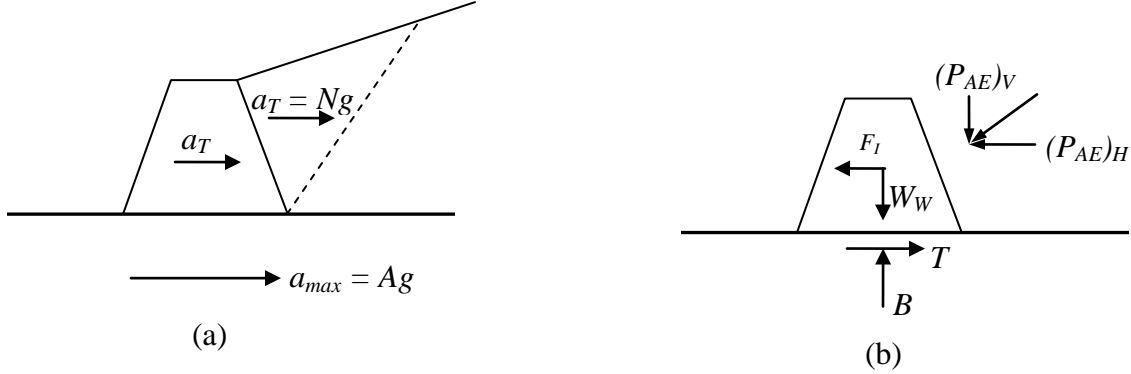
Idealization of the Retaining Wall Problem by Richards-Elms (1979); (a): Wall and Backfill Accelerations; (b): Free Body Diagram of Wall (Richards and Elms, 1979)
